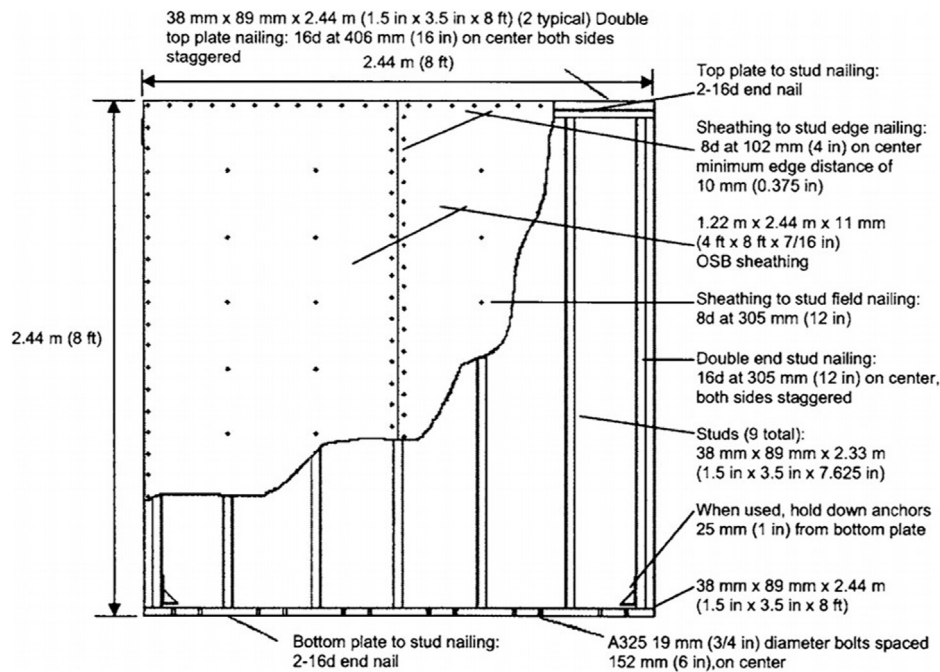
Typical shear wall specimen (Lebeda et al. [14]).
